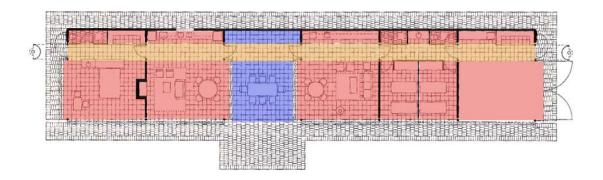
Floor Plan. The floor plan reveals a simple organization along straight circulation path. The breezeway, shown in blue, is centrally located. The footprint of the building is very small. (Phaidon)
